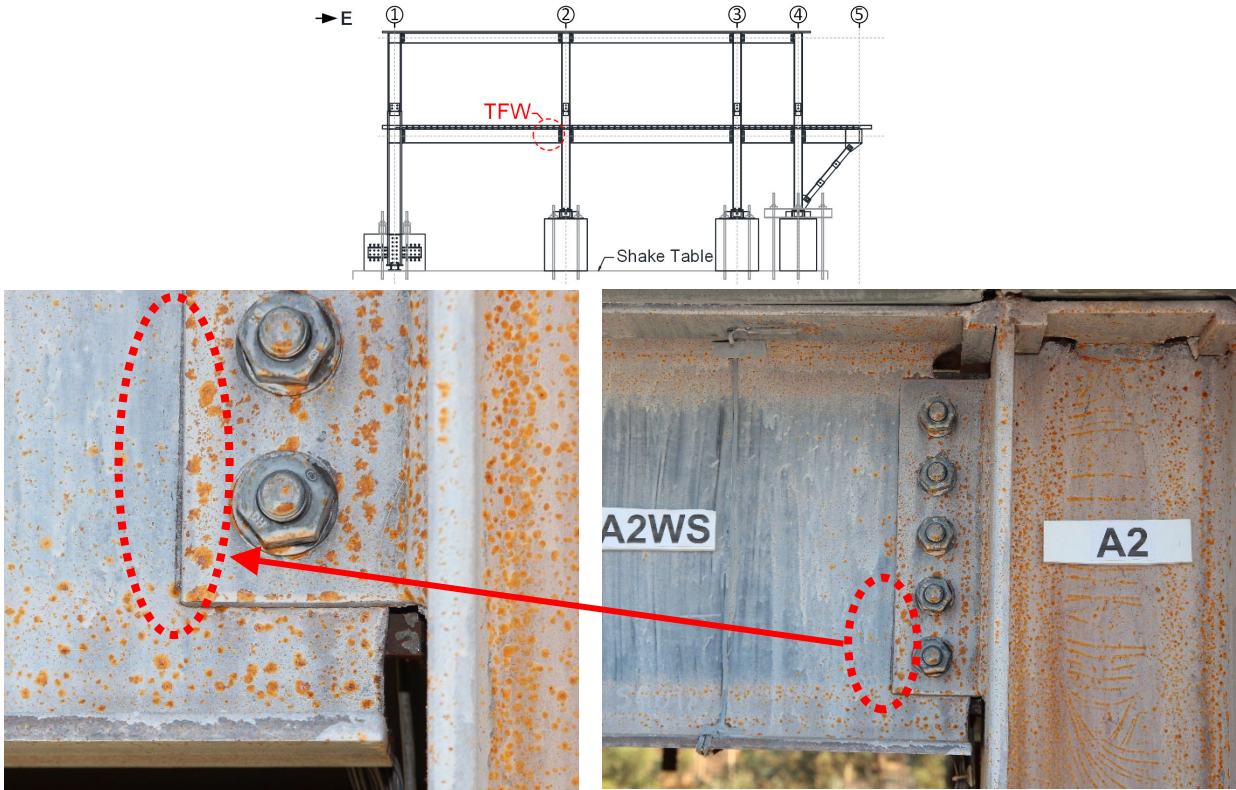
After Test 2B-3: Bolt Slippage at 2<sup>nd</sup> Floor West-Side TFW Connections
